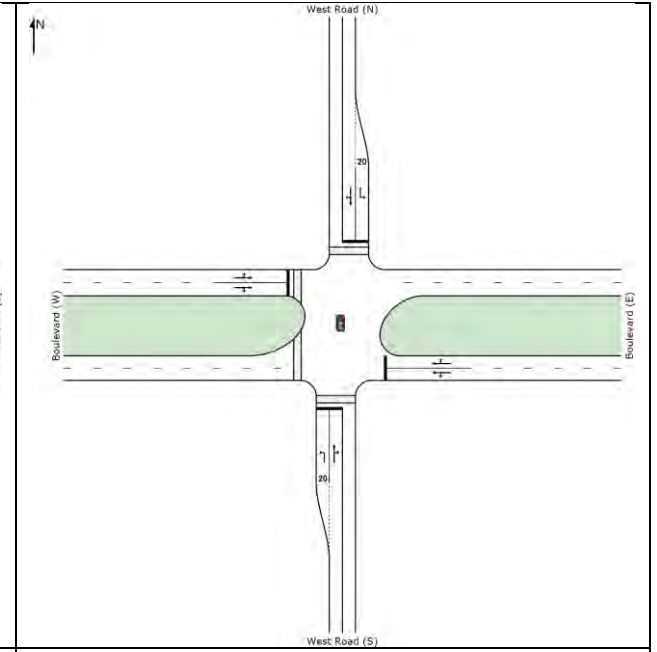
UDS Feasibility Design Parkes Way Boulevard – West Road Intersection
